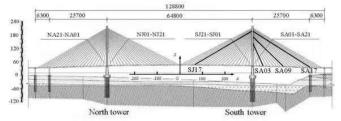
The investigated cable-stayed bridge (unit: mm).
